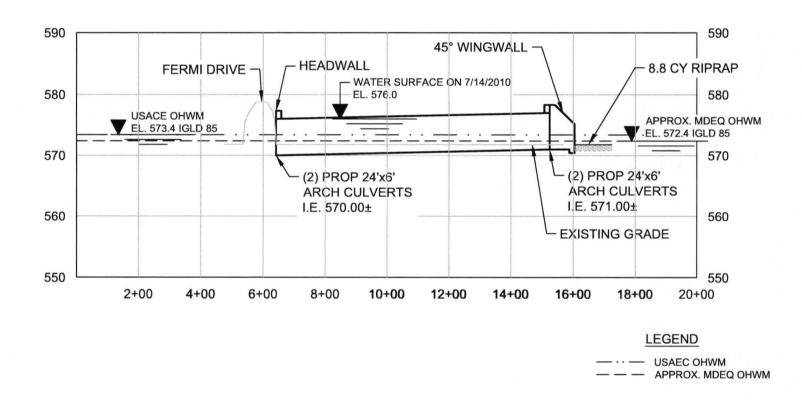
B CONSTRUCTION AREA 5 PROFILE OF PROPOSED SOUTH CANAL CULVERTS
